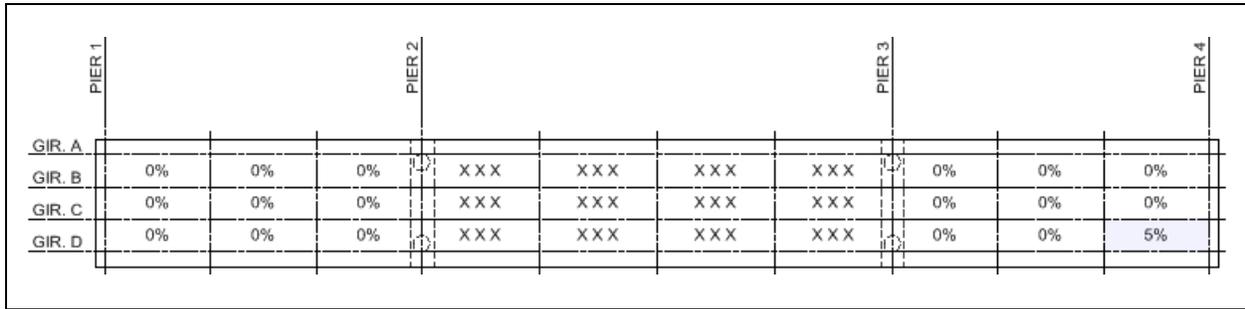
Bridge 101/44 Crack Intensity Diagram
